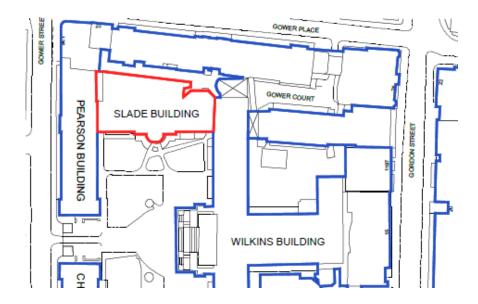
Extract of Site location plan (drawing ref. 100-01 Rev A)
